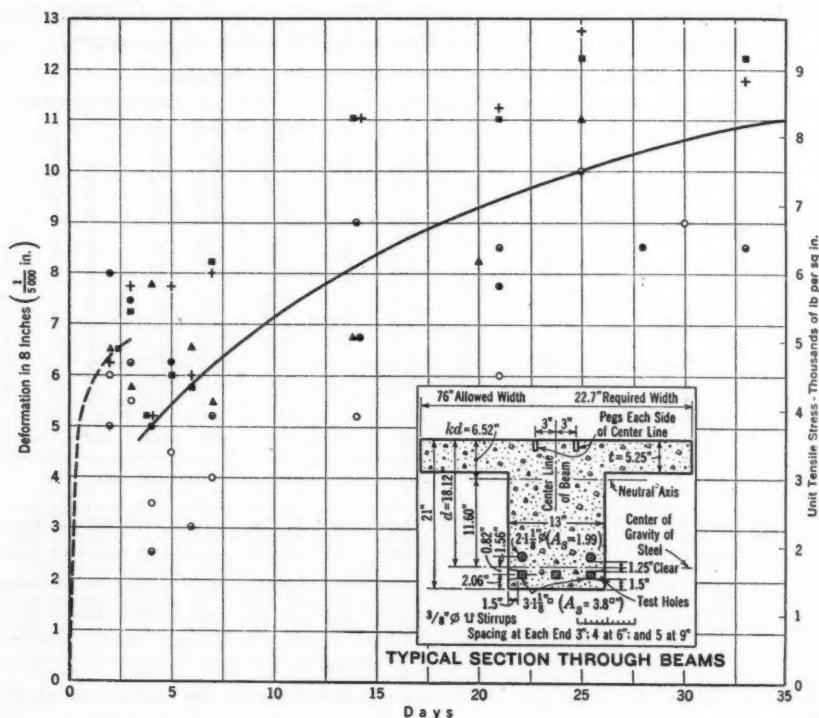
ELONGATIONS AND UNIT TENSILE STRESSES IN THE REINFORCEMENT OF THE MAIN BEAMS OF THE FIRST AND SECOND FLOORS. (CONCRETE MIX, 1 : 2 1/4 : 3 3/4).
